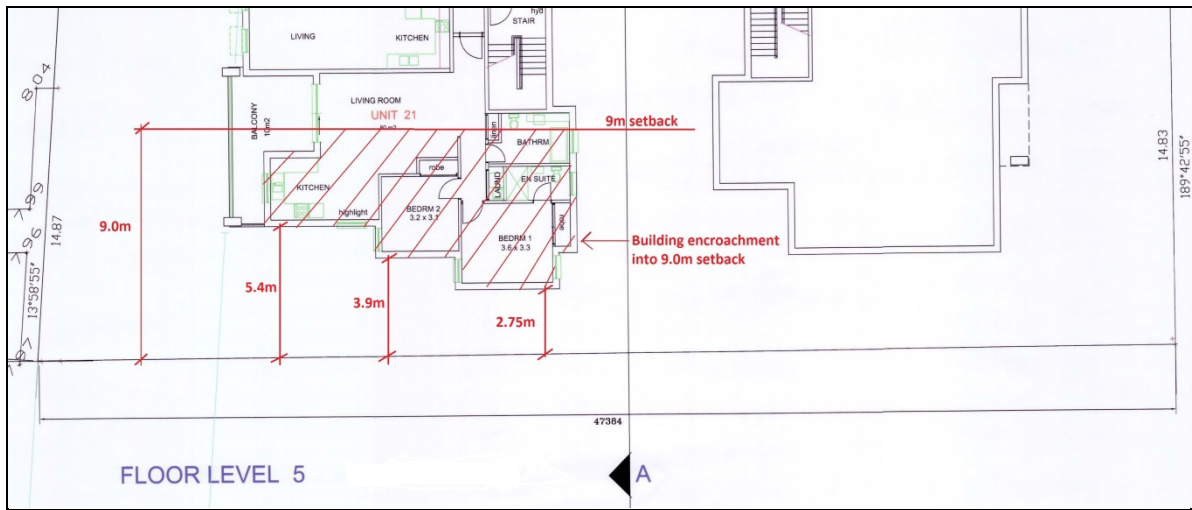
Level 5 building encroachment into 9m side setback on the southern boundary.
